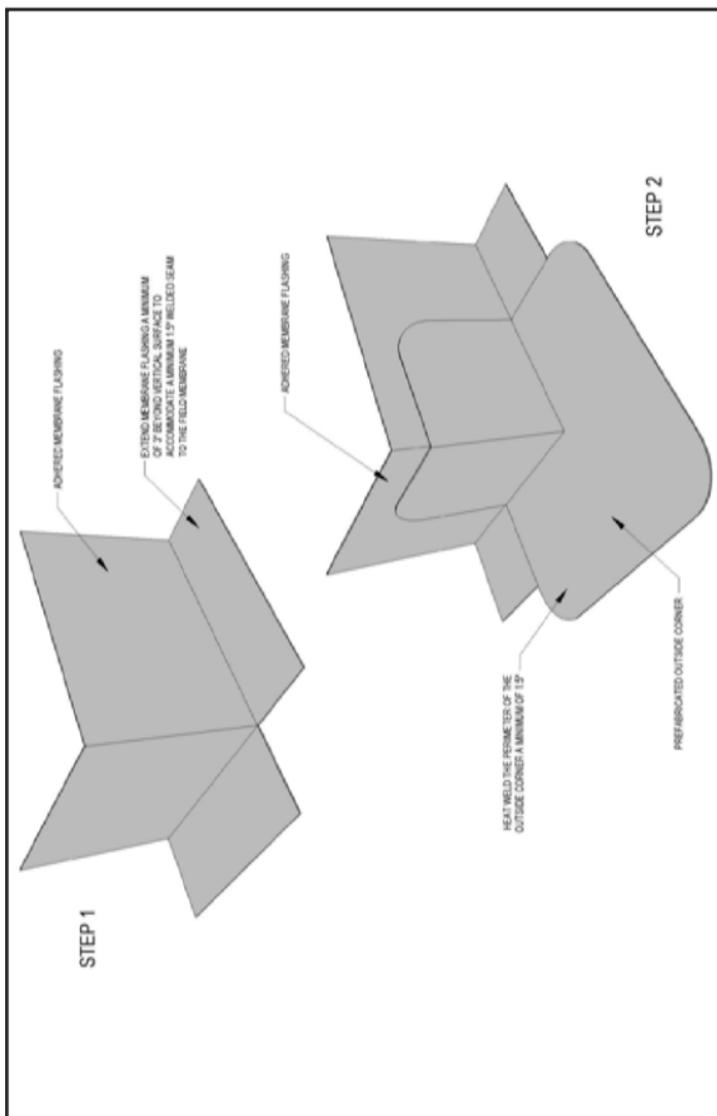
Adhered PVC Flasing Membrane At Prefabricated Outside Corner
